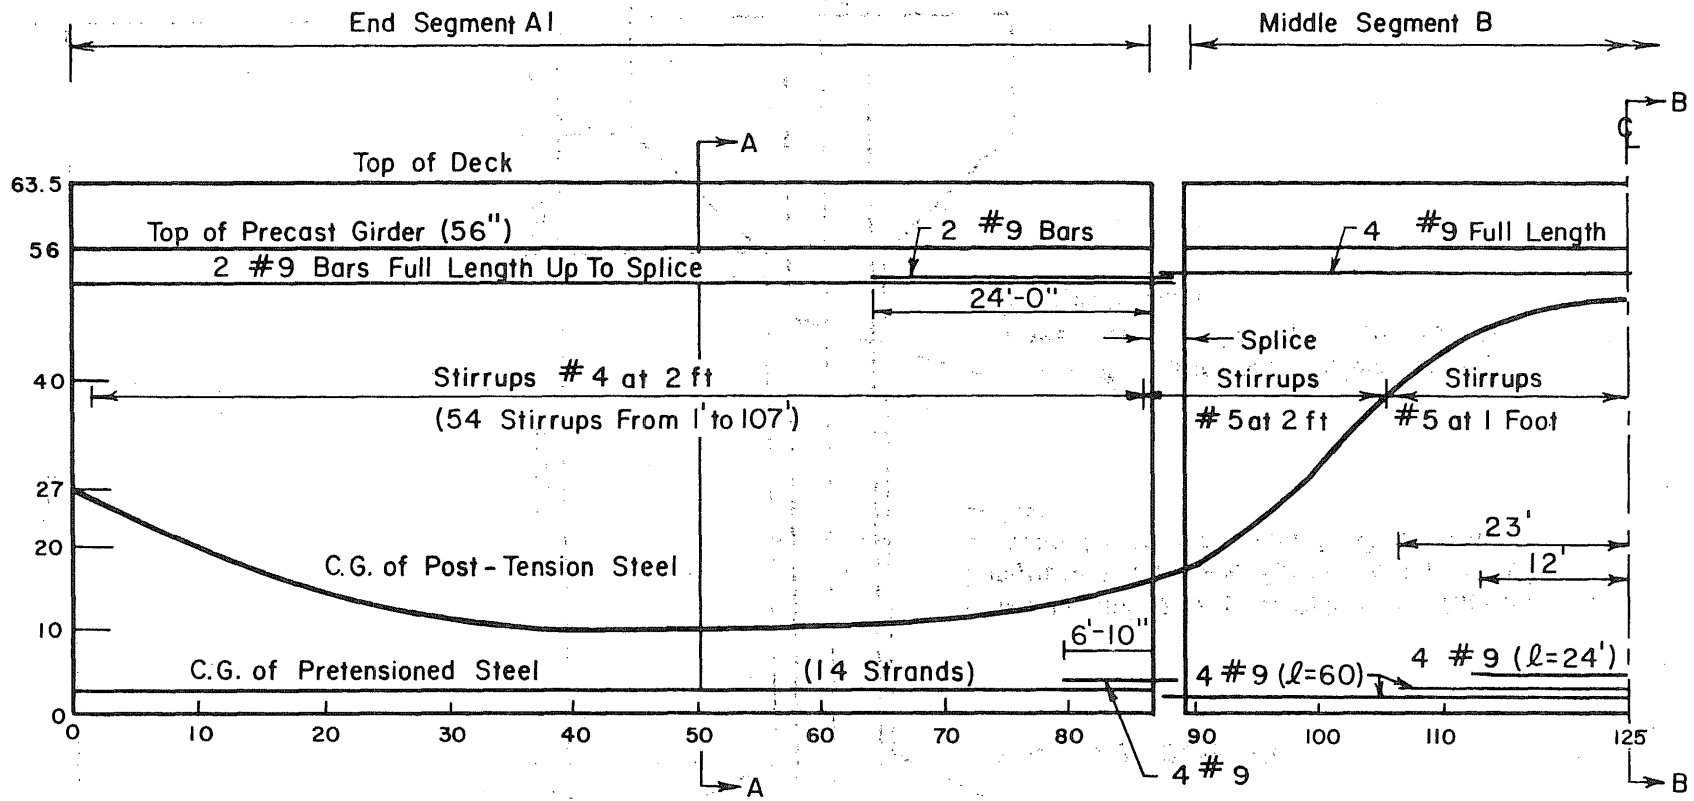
REINFORCEMENT ARRANGEMENT ALONG HALF-LENGTH OF STRUCTURE
